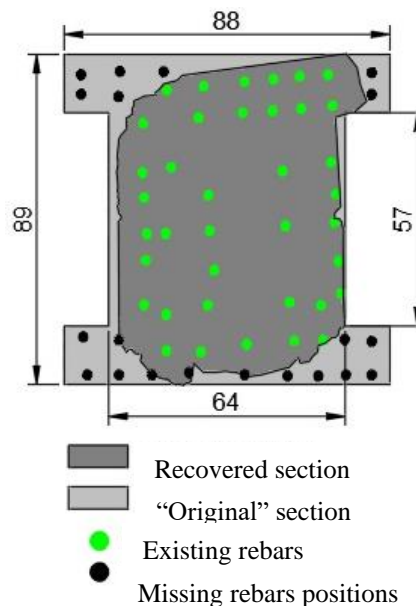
Reconstitution of the cross section of the recovered rubble column.
